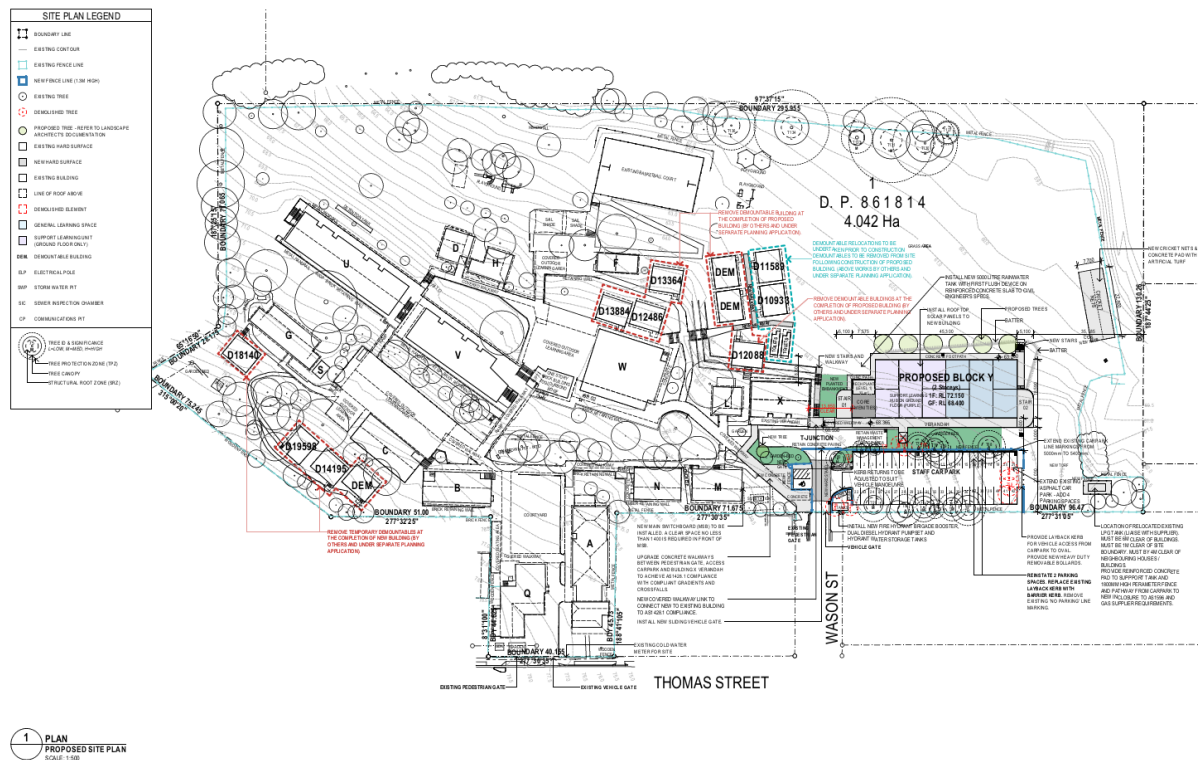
Extract of the proposed site plan (Source: Fulton Trotter, 2025)
